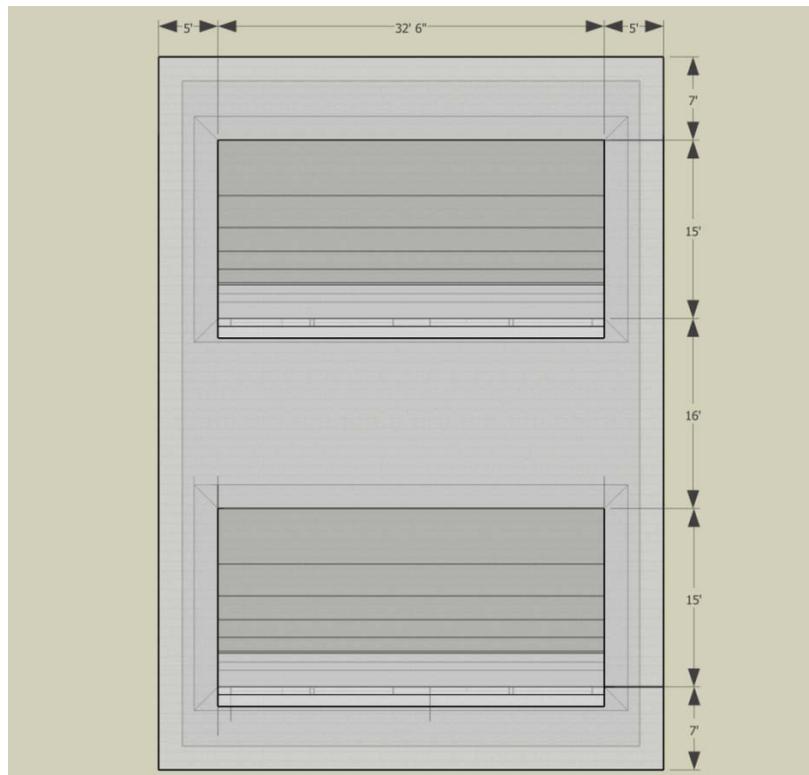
Cafeterias with south-facing roof monitors – reflected ceiling plan
